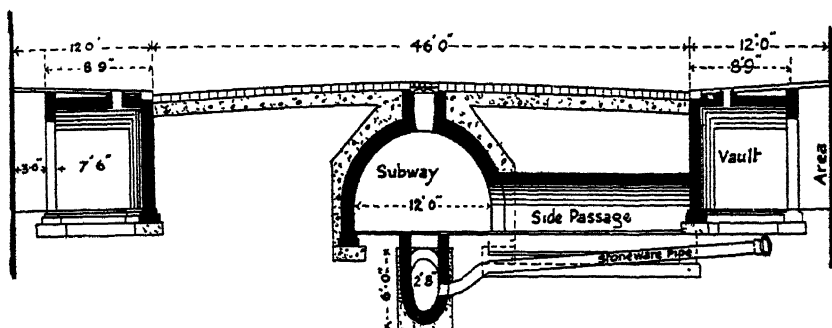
SECTION OF SUBWAY, VICTORIA EMBANKMENT, LONDON.
